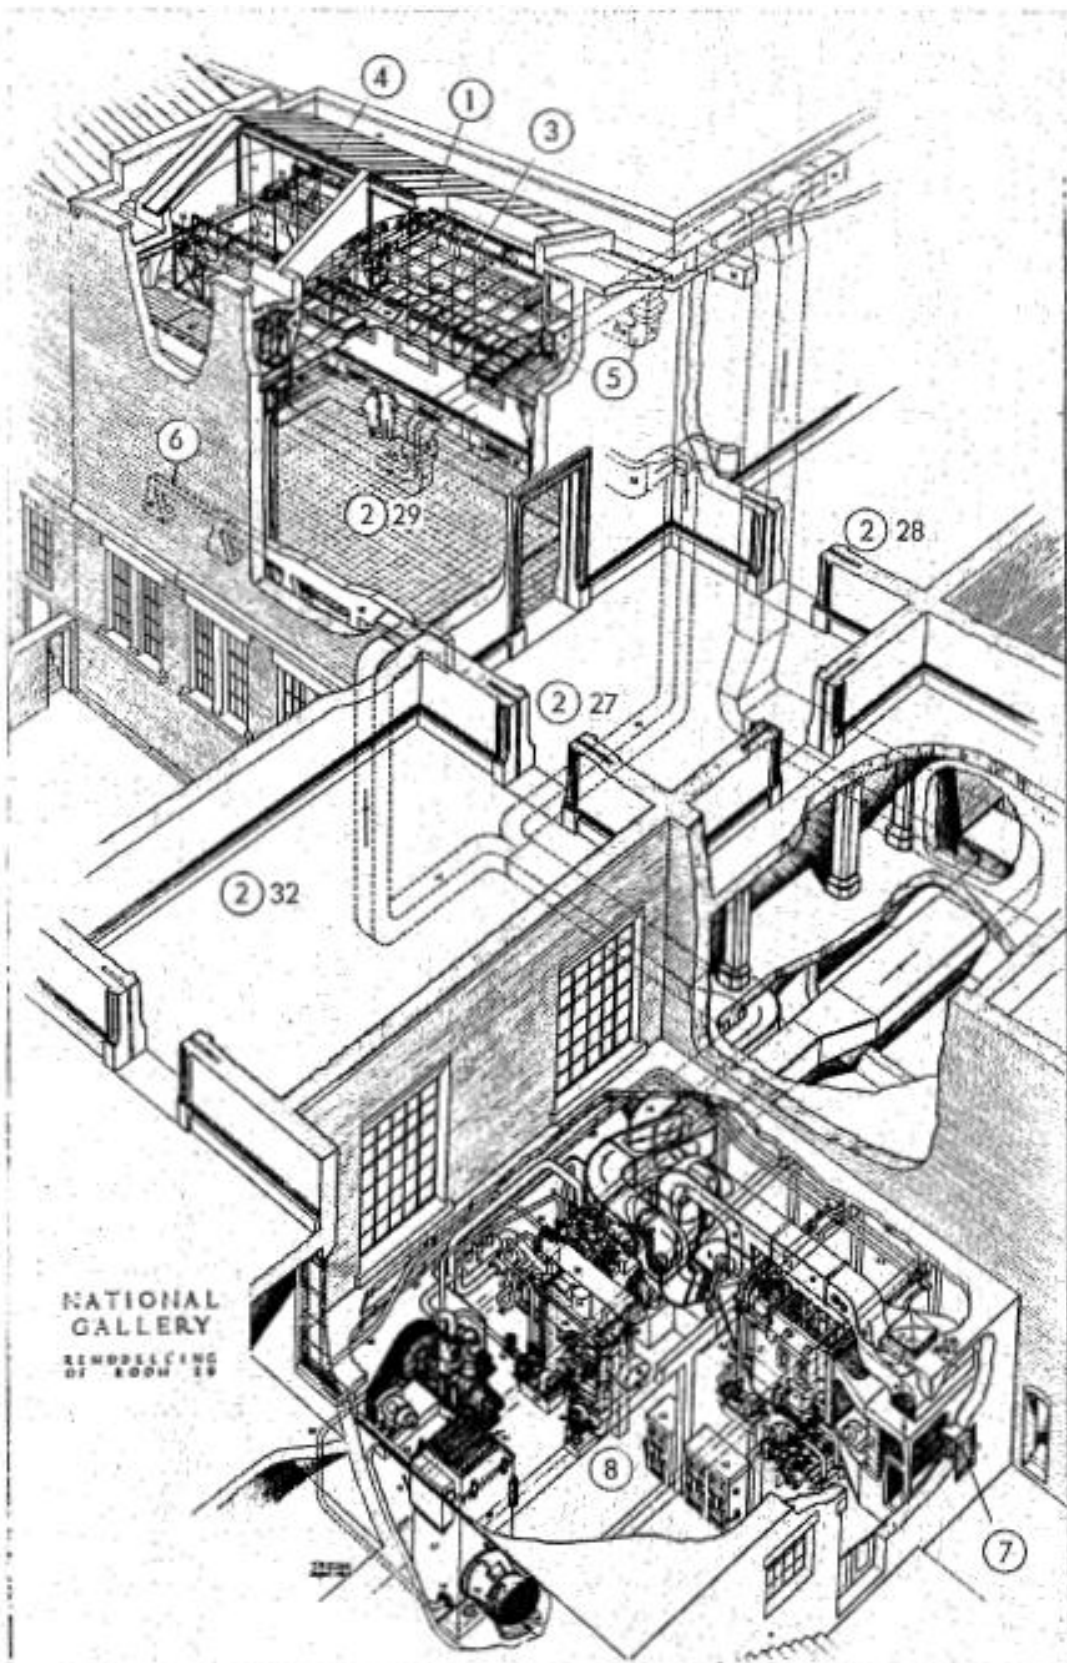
National Gallery, London. Scheme of the air conditioning: 1) Glass roof to gallery; 2) Rooms 27, 28, 29, 32; 3) Laylight with built-in fluorescent tubes for supplementary lighting; 4) Travelling cradle; 5) Conditioned air supply to gallery; 6) Used air taken from gallery; 7) Fresh air intake; 8) Plant room
